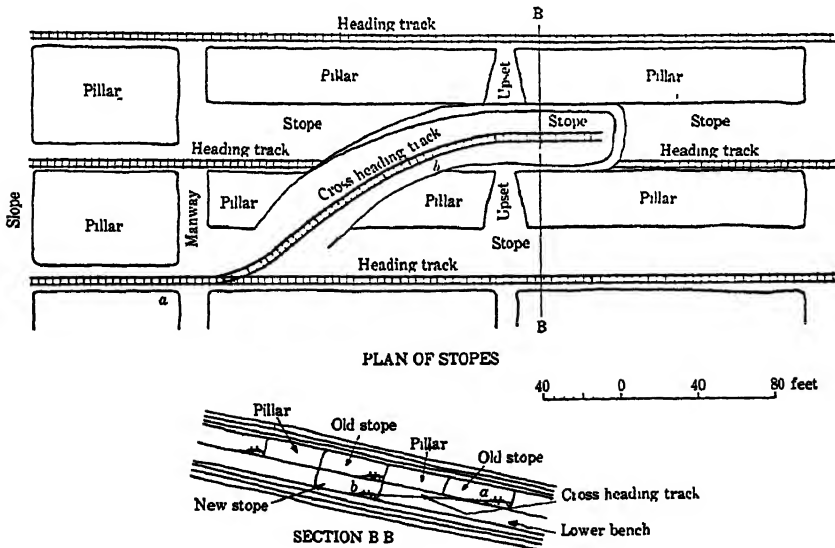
WORKING LOWER BENCH OF BIG SEAM BY CROSS-HEADING.
